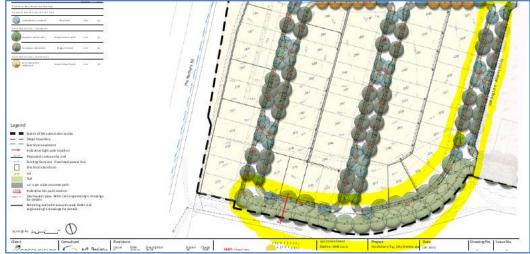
Approved landscaping plan under DA/2022/704/1. Road 421 is outlined in yellow.
